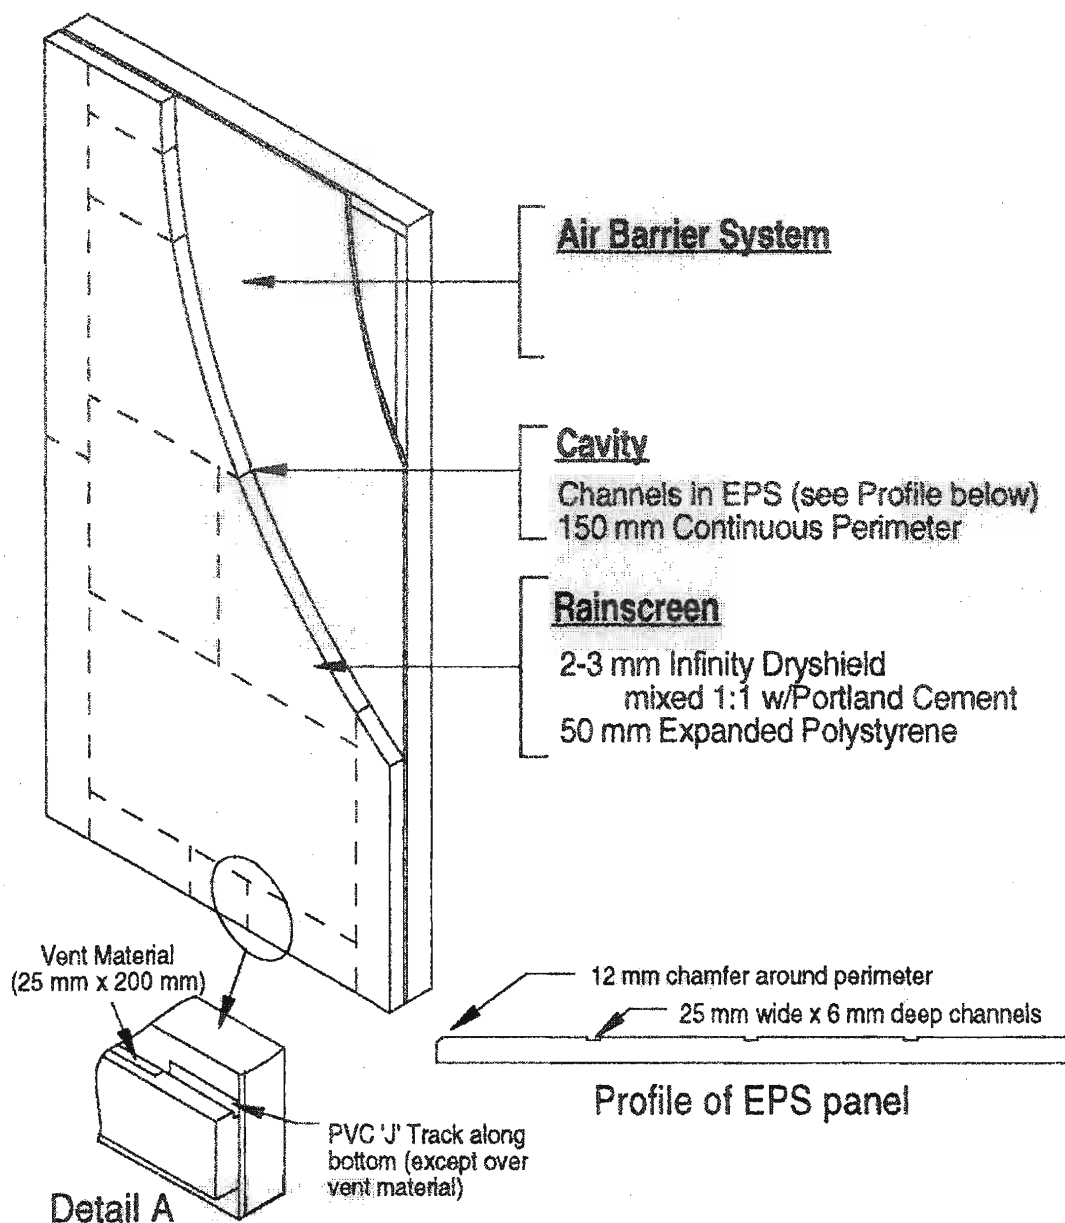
Details of construction of the exterior insulation and finish (EIFS) test specimens.
